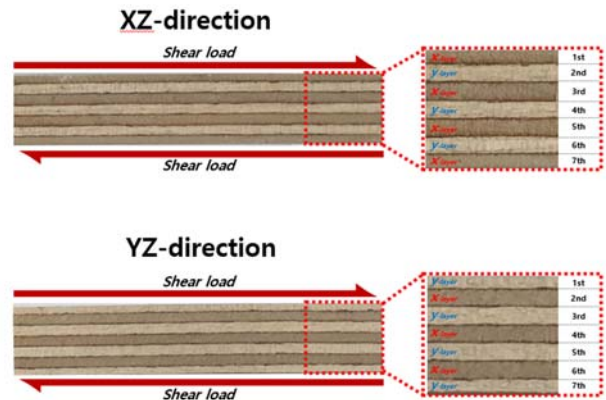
Plywood direction definition and shear loading direction for 9 mm plywood (7-ply)
